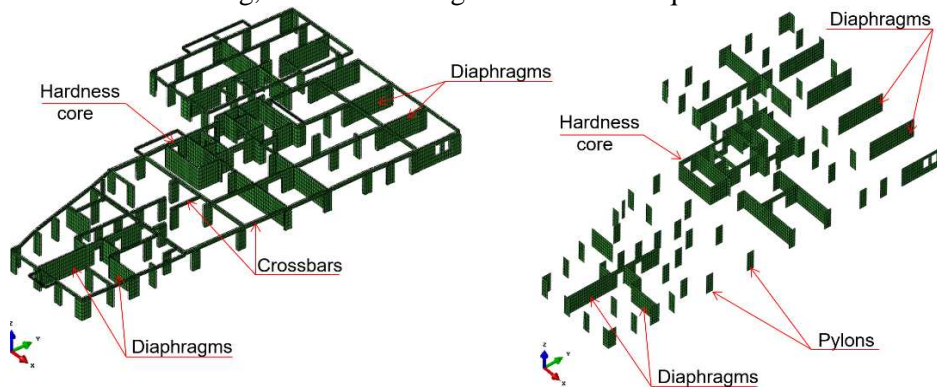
Types of reinforced concrete frame: a) girder , b) non-girder
